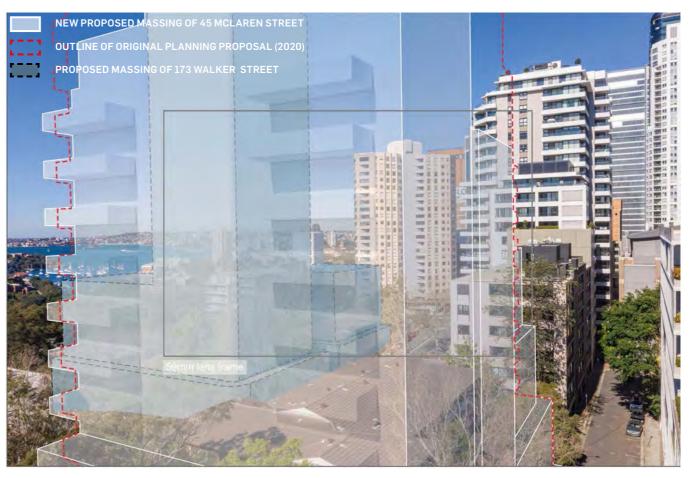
PHOTOMONTAGE INDICATING PROPOSED INDICATIVE BUILDINGS
